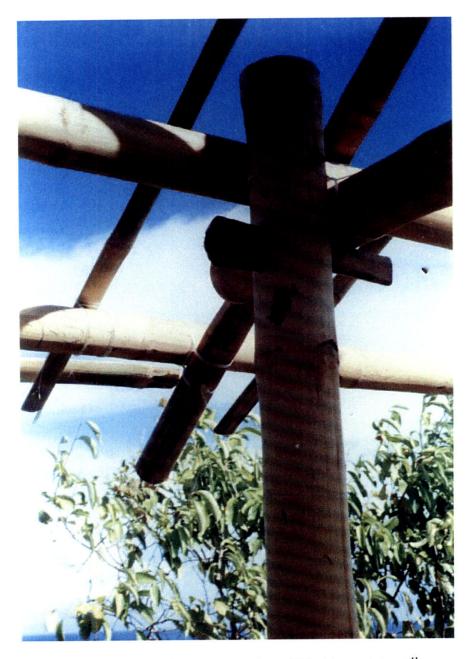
Beam-Column connection with lashing and dowel⁴¹
